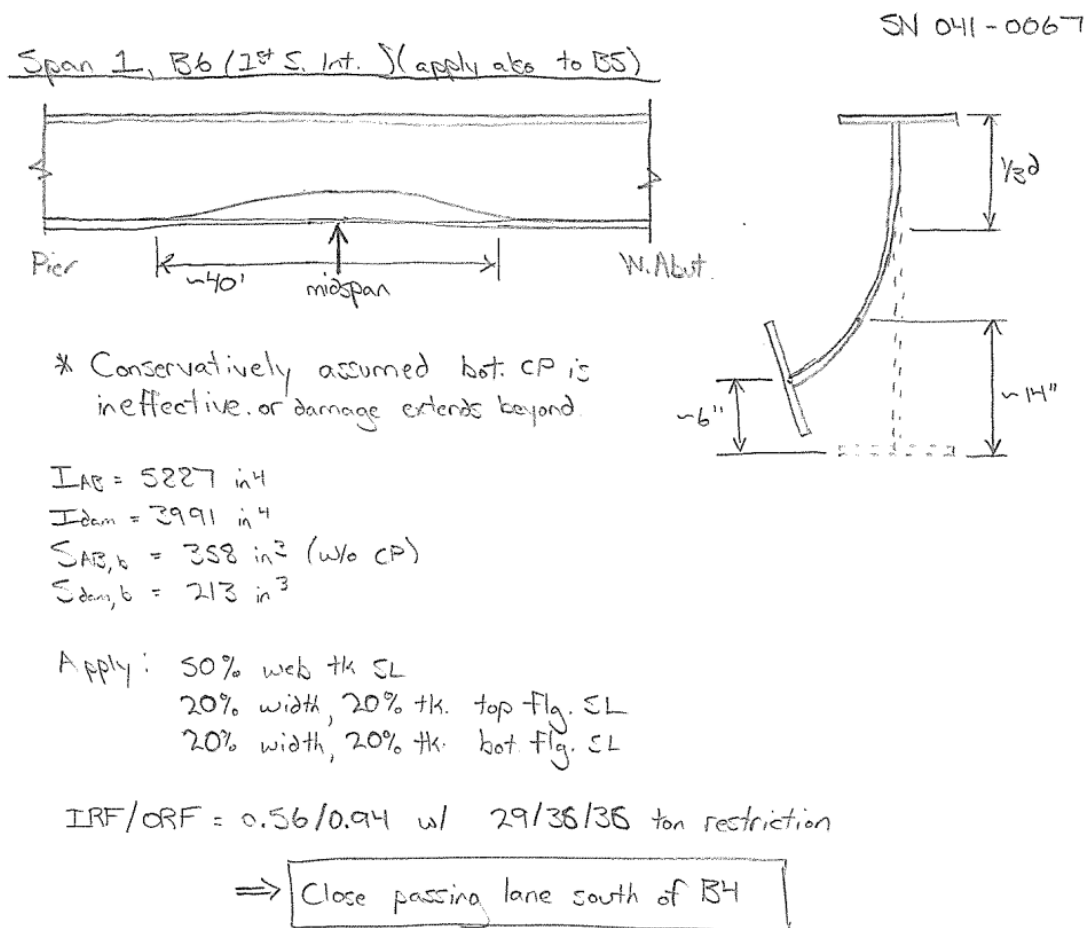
Illustration. Summary of damage assessment parameters for IDOT bridge SN 041-0076 Girder 6.
